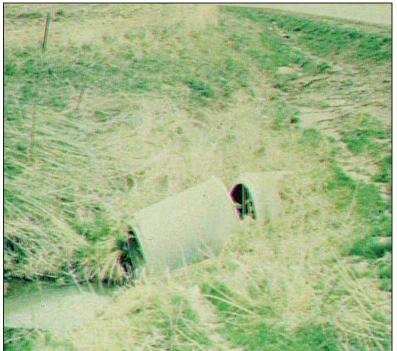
Photo. RCP culvert damaged by scour.⁽²⁾
